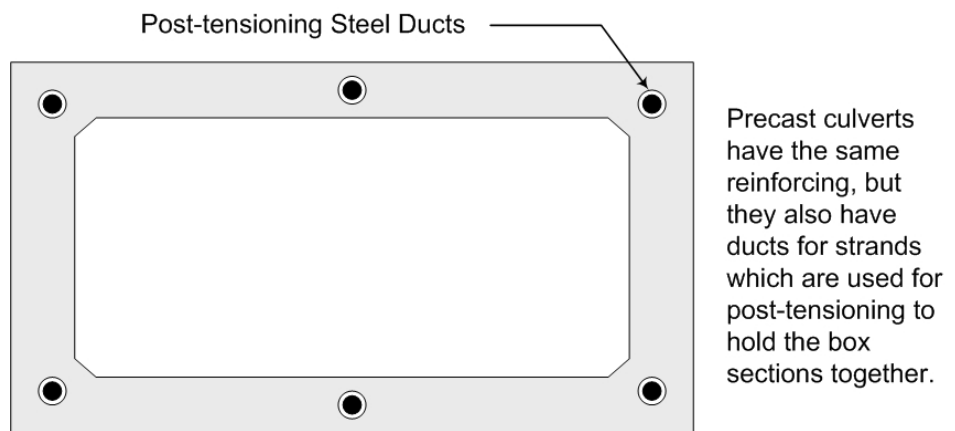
Precast Box Section with Post-tensioning Steel Ducts
